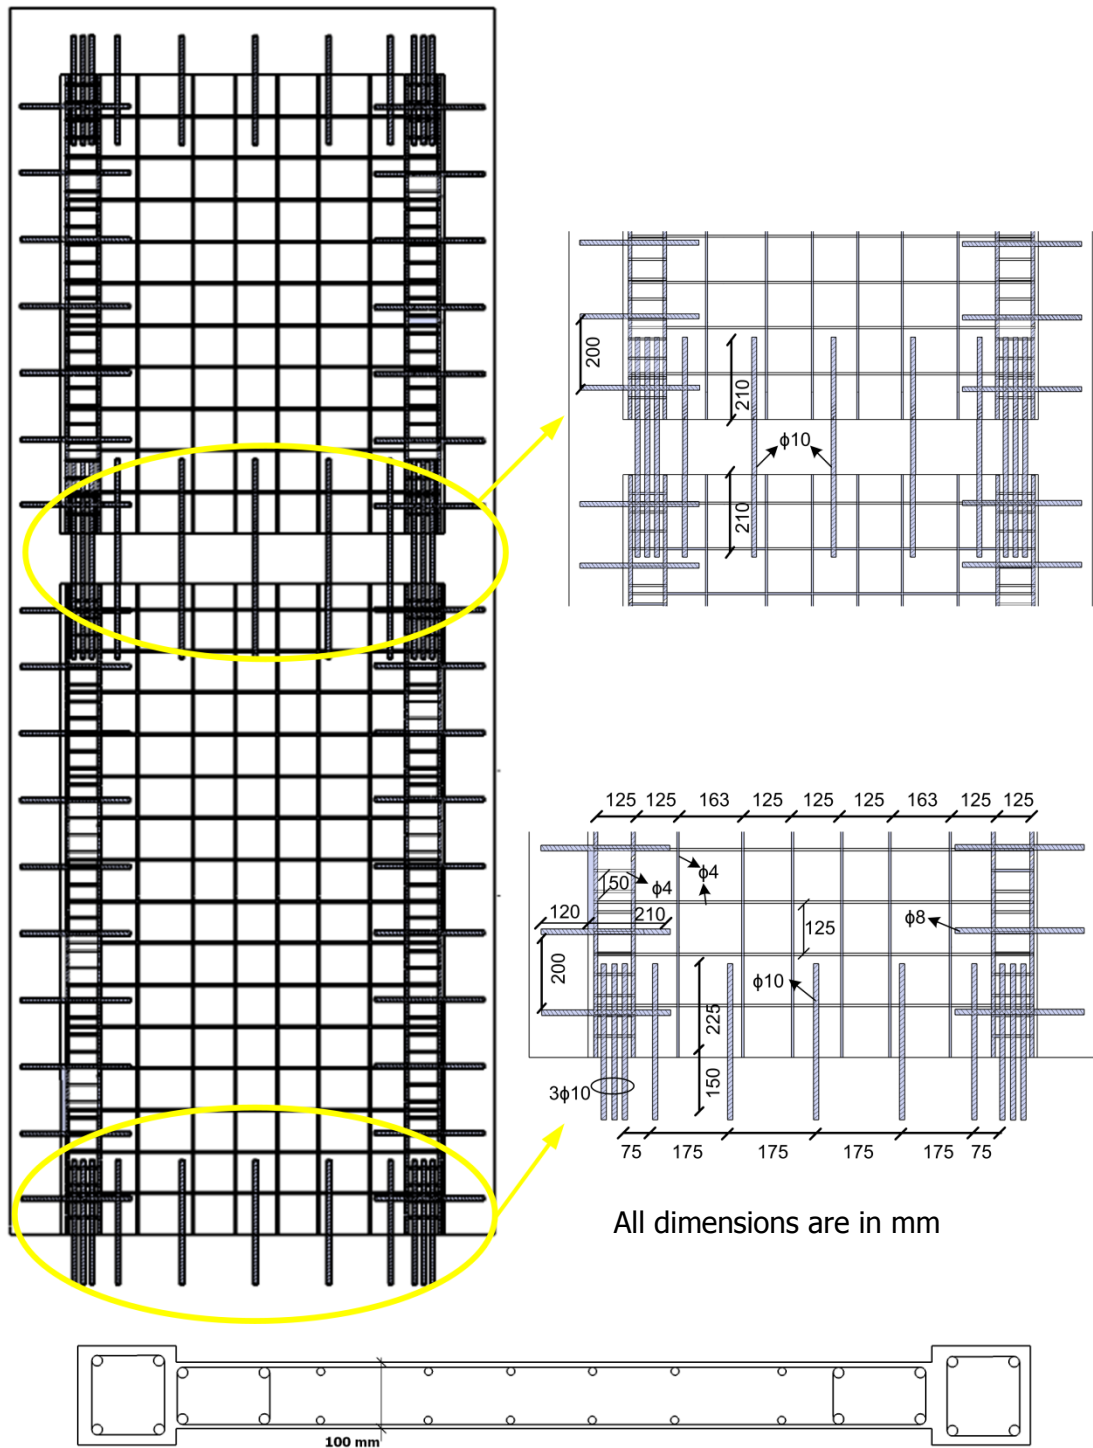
Representative views of reinforced concrete infill wall reinforcements, anchorages and cross-section
